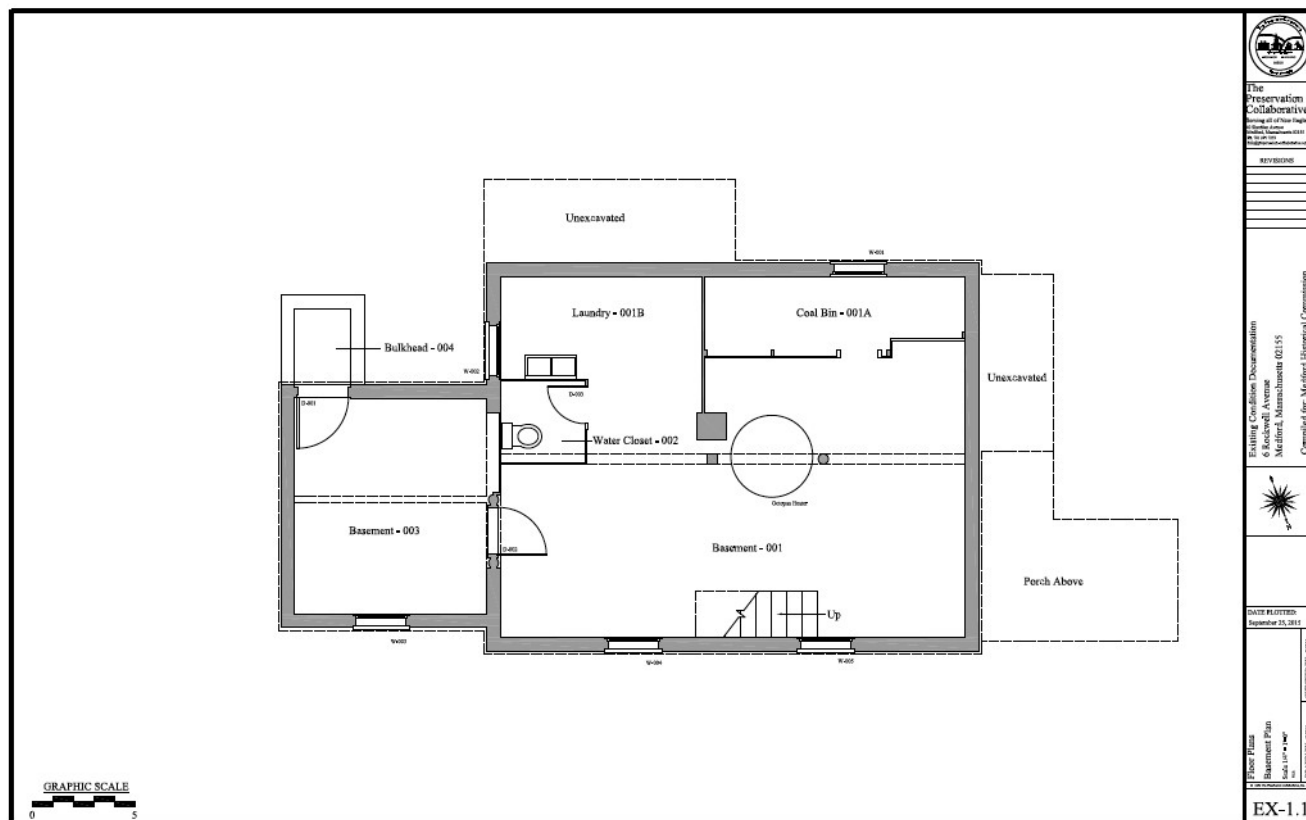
Cellar plan, existing conditions. Drawing by Ryan Hayward.
